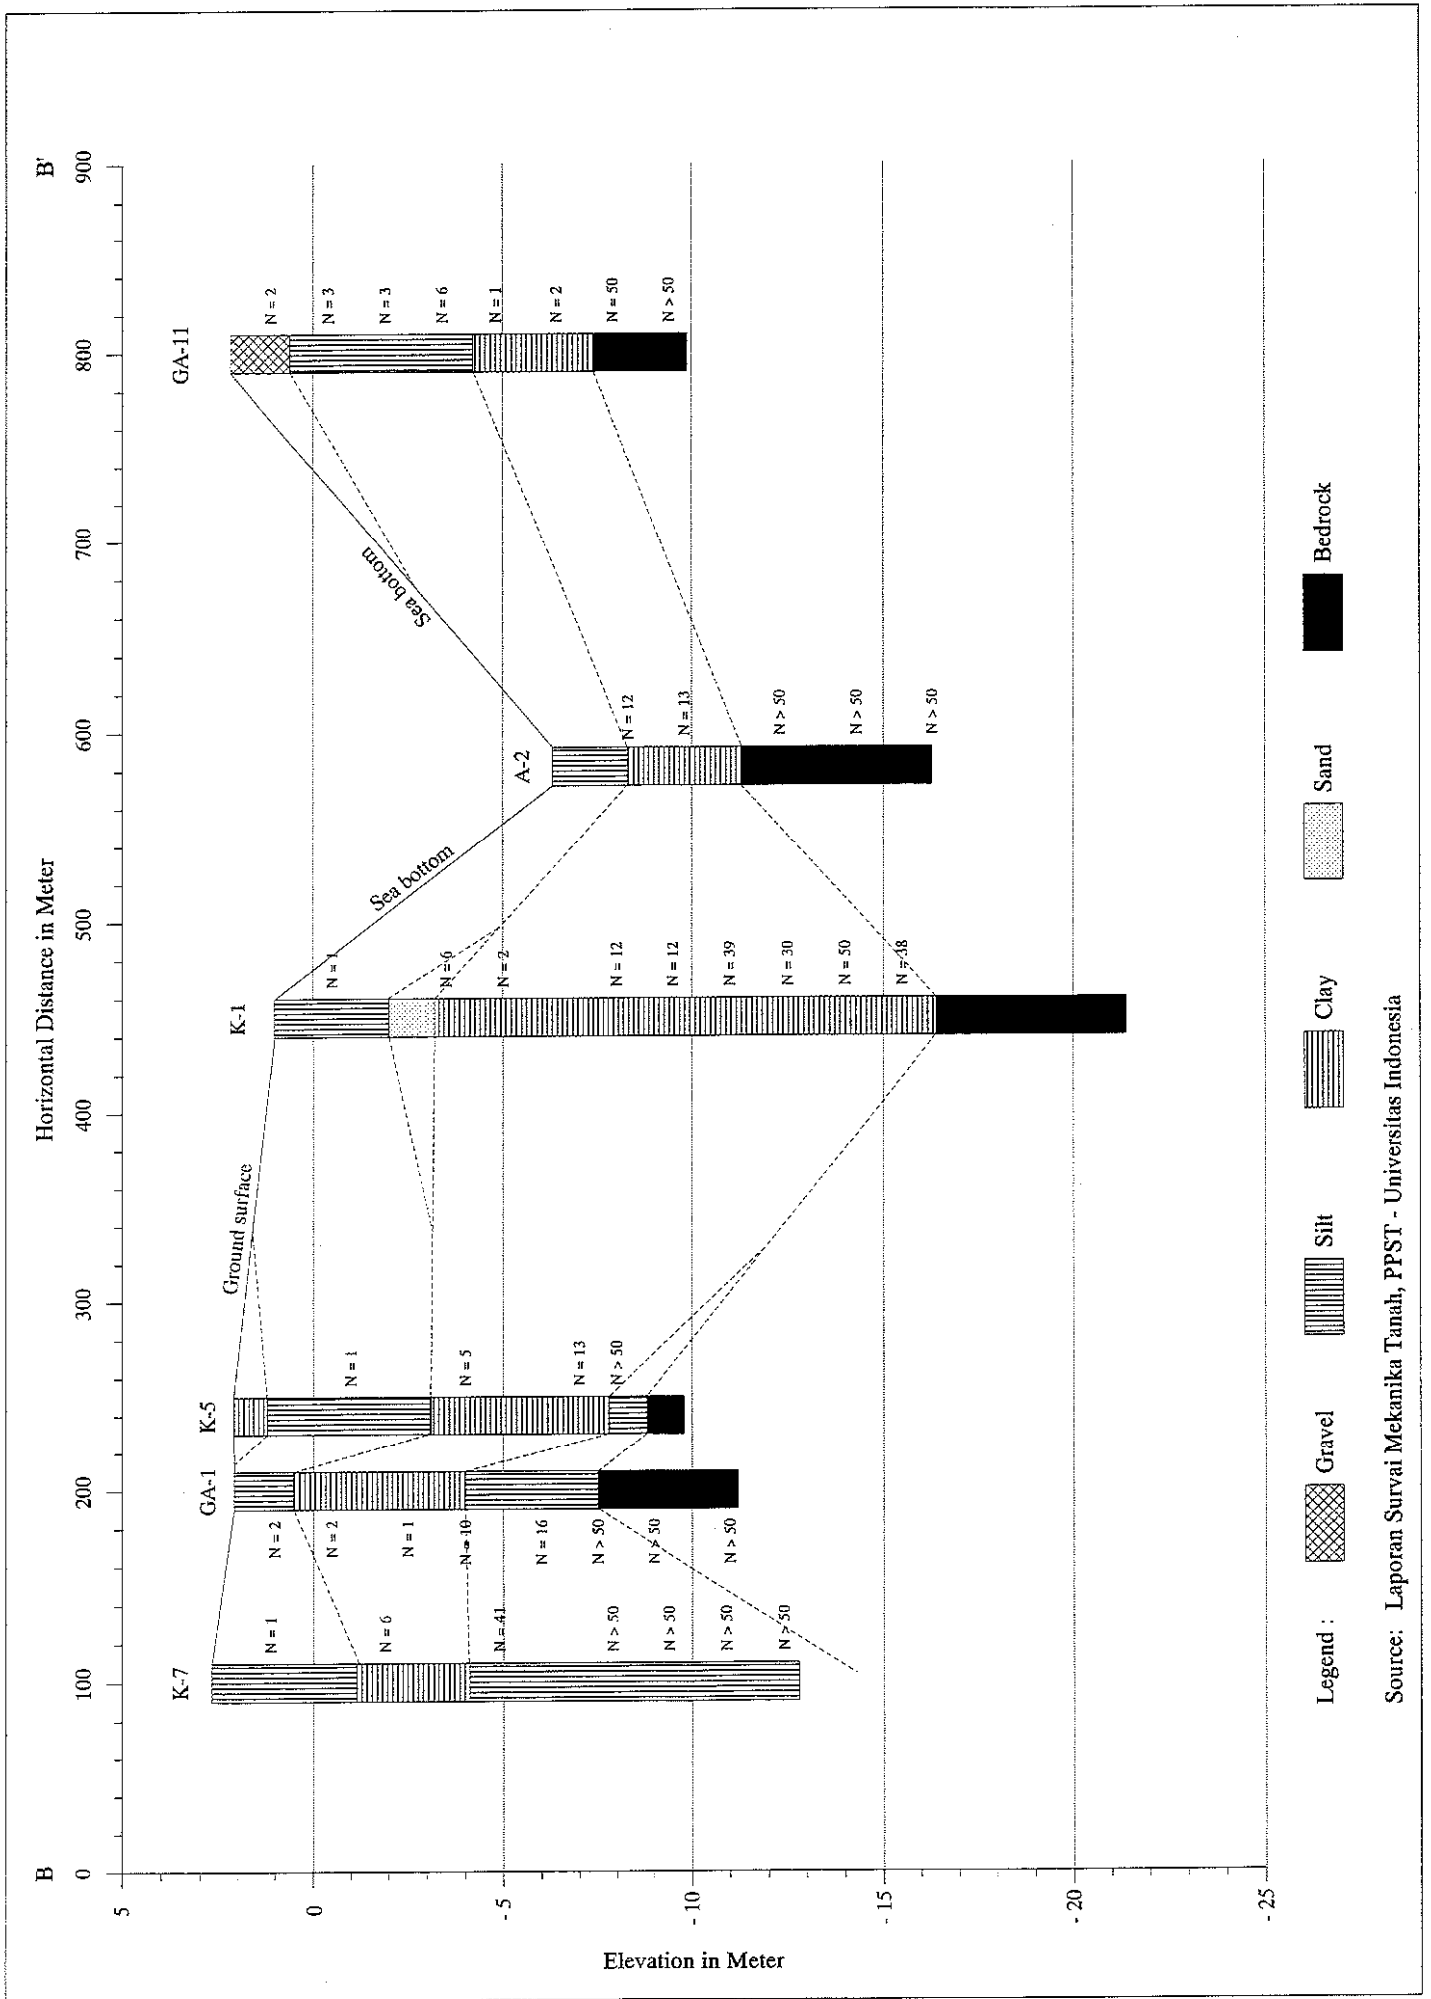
"Geological Profile (B - B' Section) at Proposed Project Site, Bojonegara"
